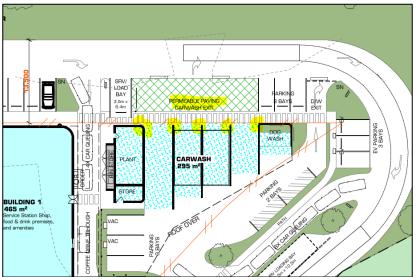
Extract from Site plan Drg DA0002 – P11 – Push Architecture
